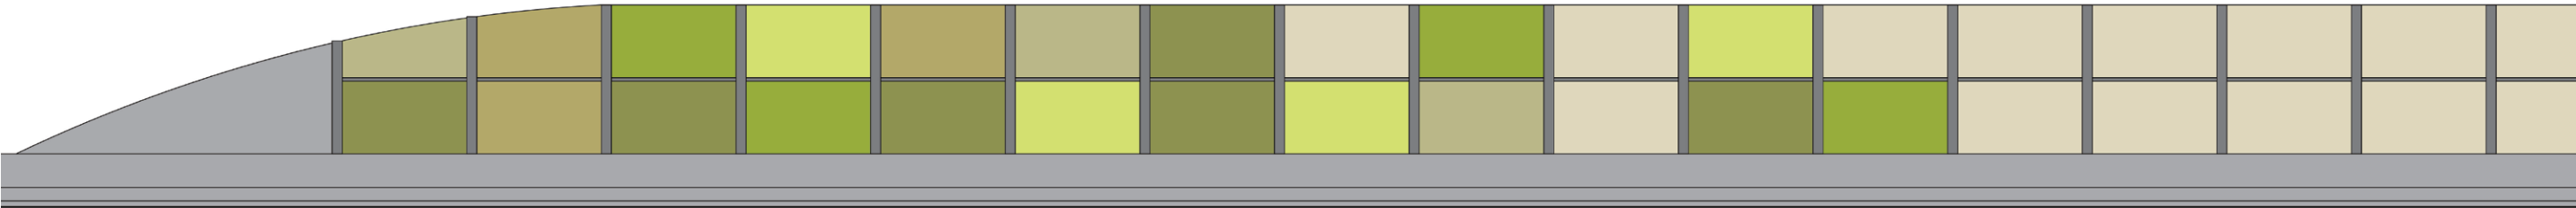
Indicative Elevation and Detailed Profile of Noise Wall Type 1
